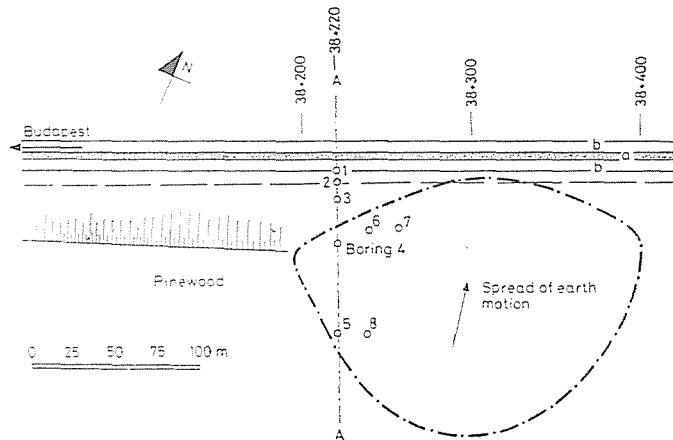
Layout of the landslide a — central reserve; b — pavement
